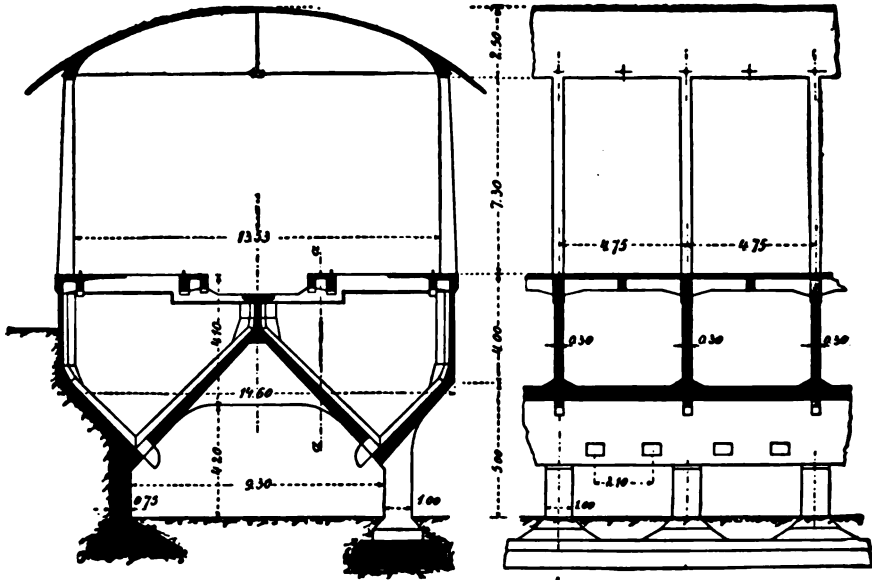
Düdelingen ore pockets. Cross and longitudinal sections.
